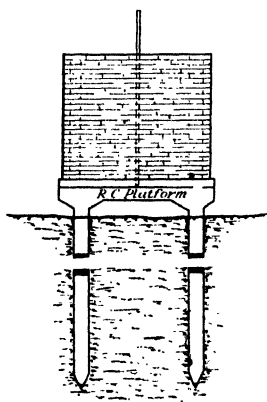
Concrete Group Pile Test, R.C. Platform.
